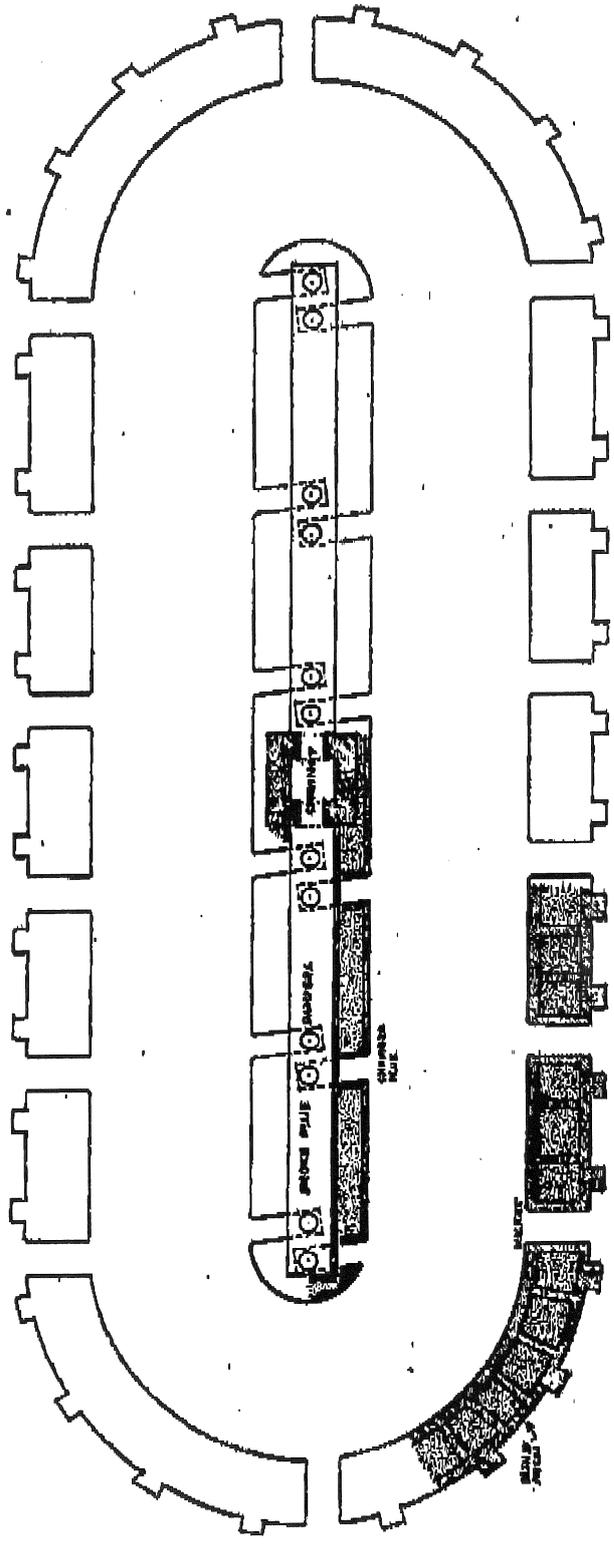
1868 HOFFMAN KILN, MAPPERLEY RISE BRICKWORKS, NOTTINGHAM, UK
